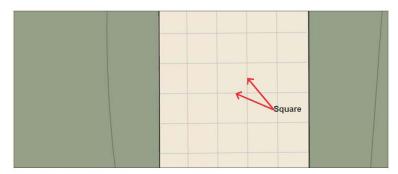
Sidewalk and crosswalk scoring detail plan
